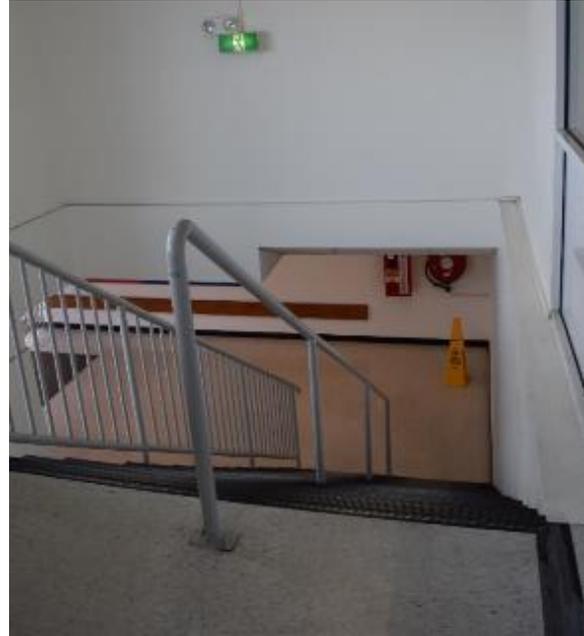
Looking south within the subject building. Note: the accessibility ramp provides entry to the Officeworks
